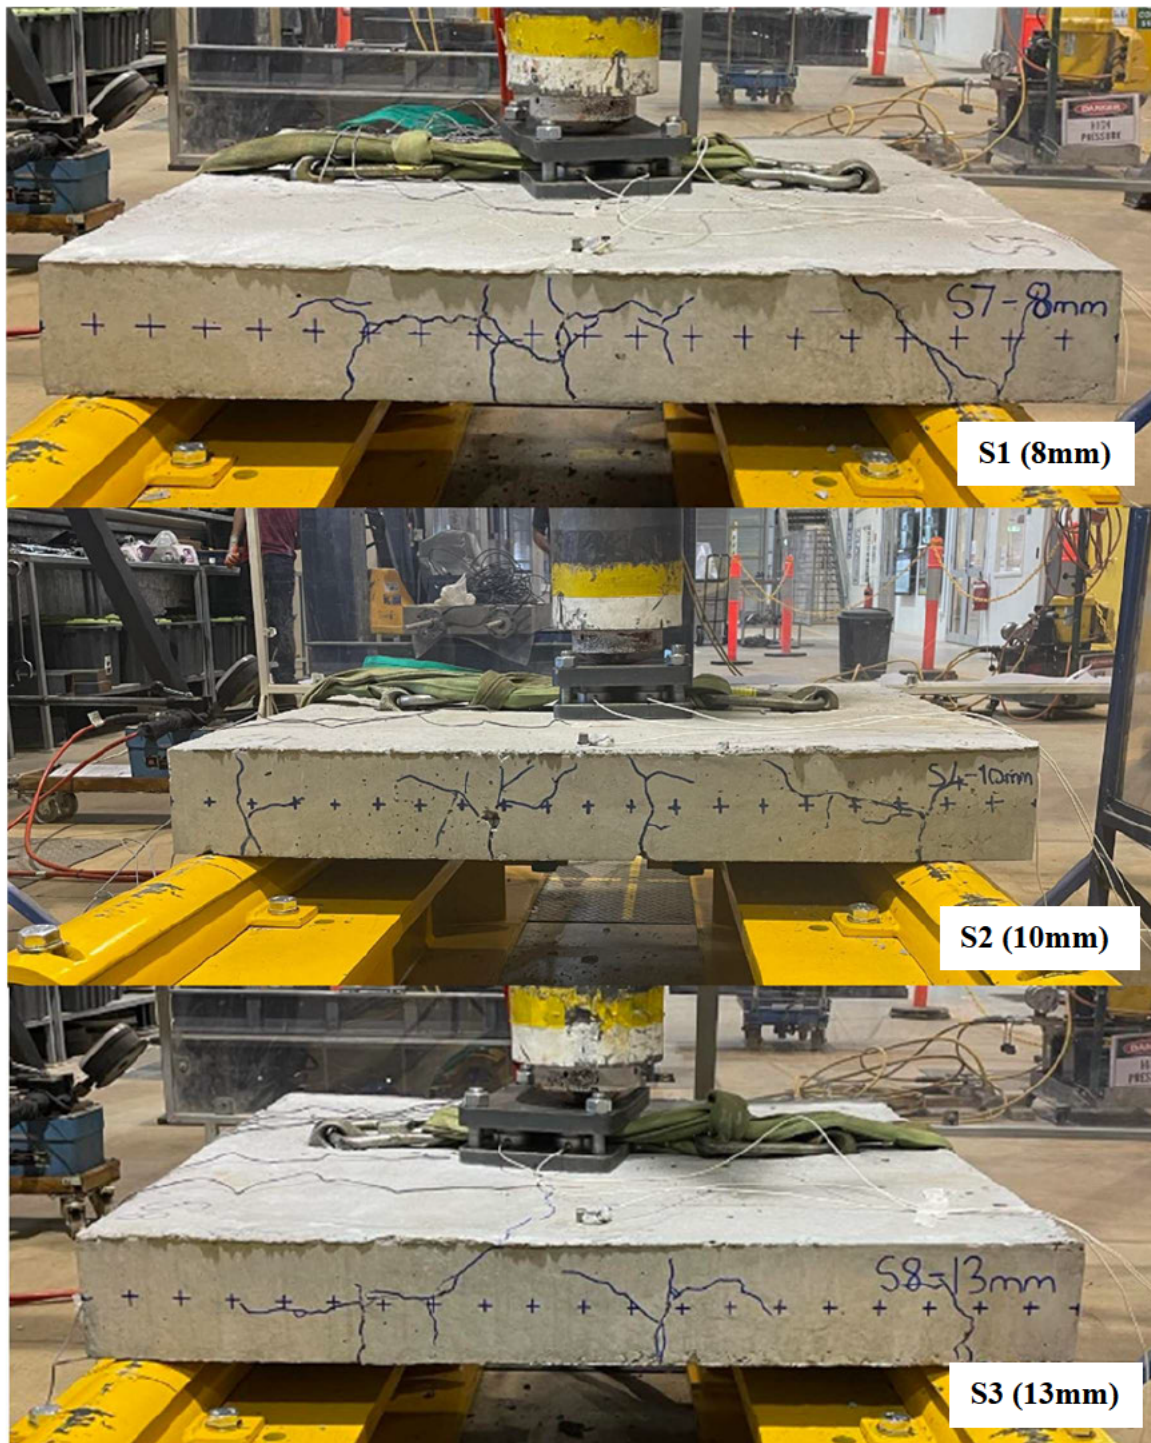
Cracking Pattern of Test Slabs (Side Face)
